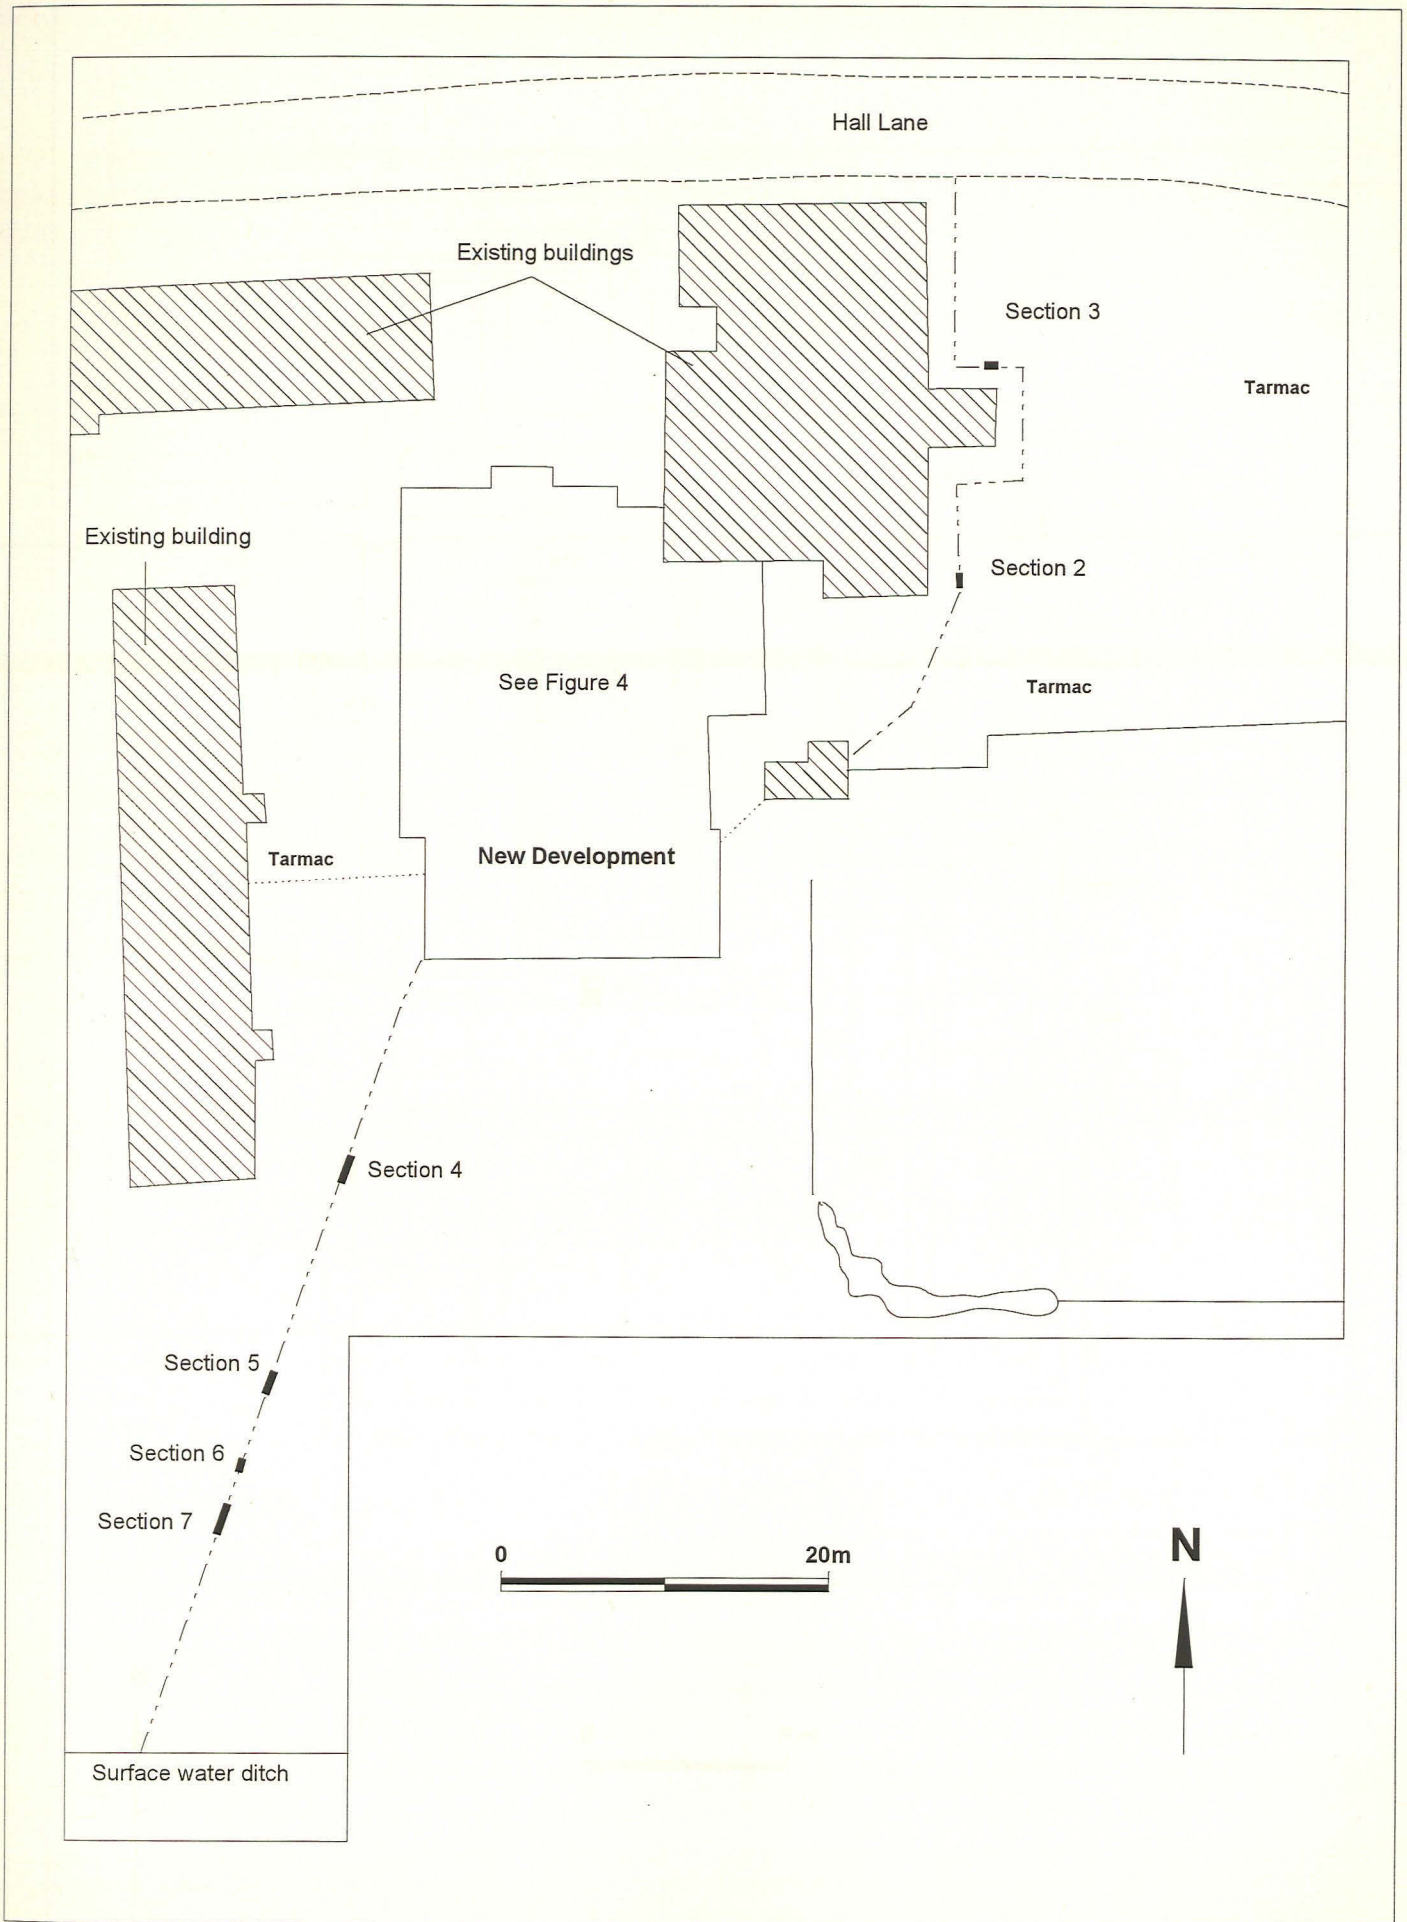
Plan of Drainage Layout, showing location of drawn Sections
